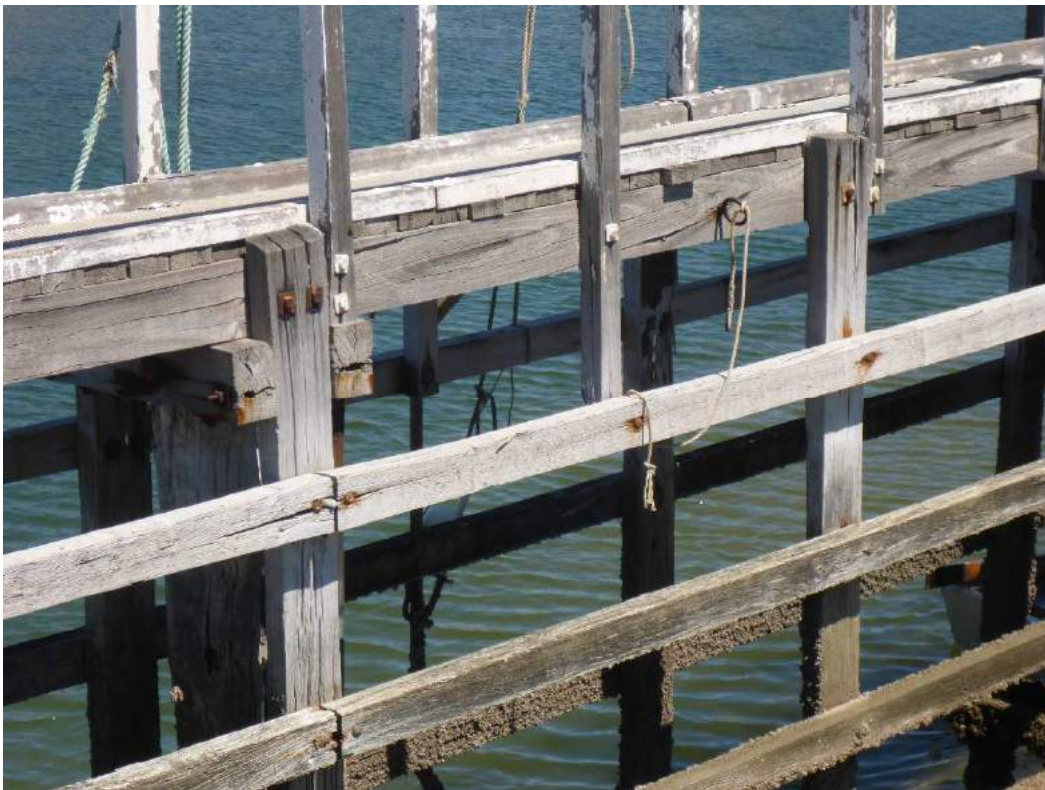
Timber girders with minor longitudinal cracking and crossheads with split ends
